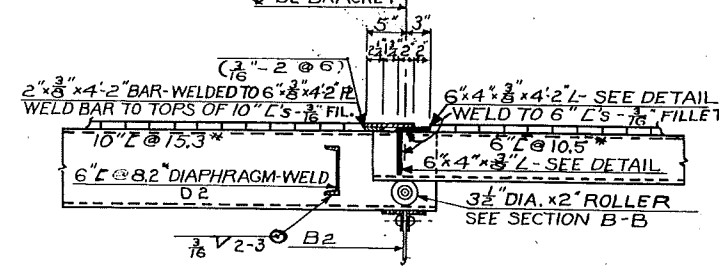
SECTION A-A - 6 REQ'D
